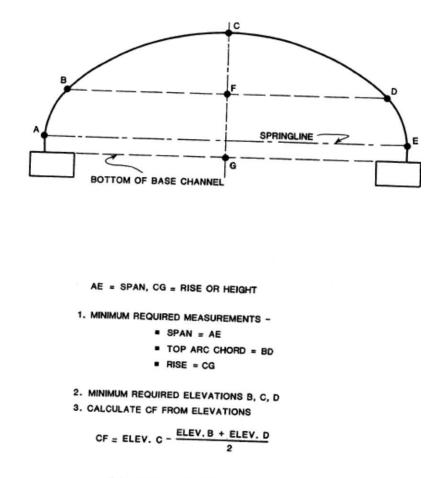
(Exhibit 96) Shape Inspection Low Profile Long Span Arch
